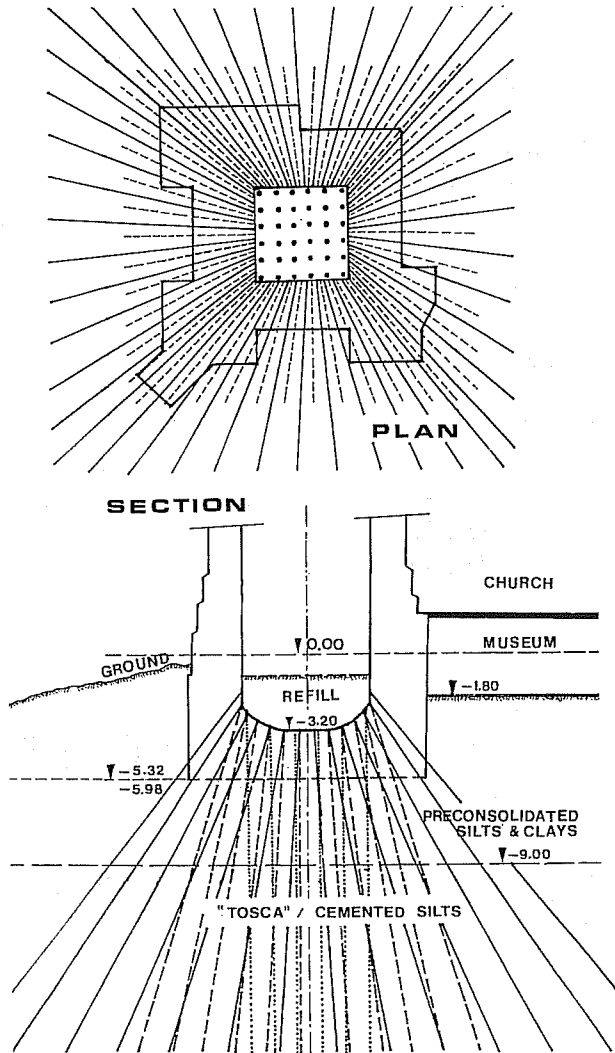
REINFORCED FOUNDATION WITH MICROPILES
